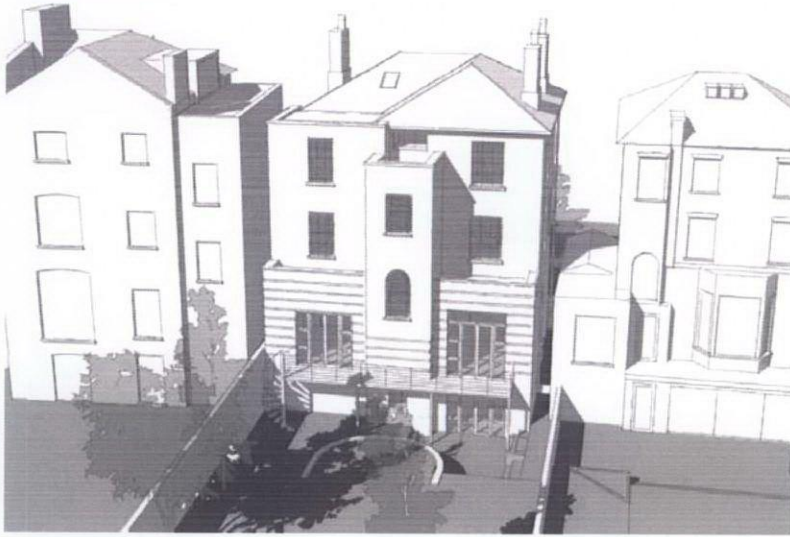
Sketch Render showing existing rear elevation- Existing condition.
